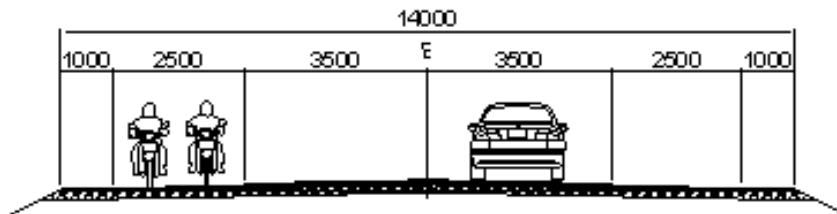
Typical Cross Section of Sri Sophorn Bypass
